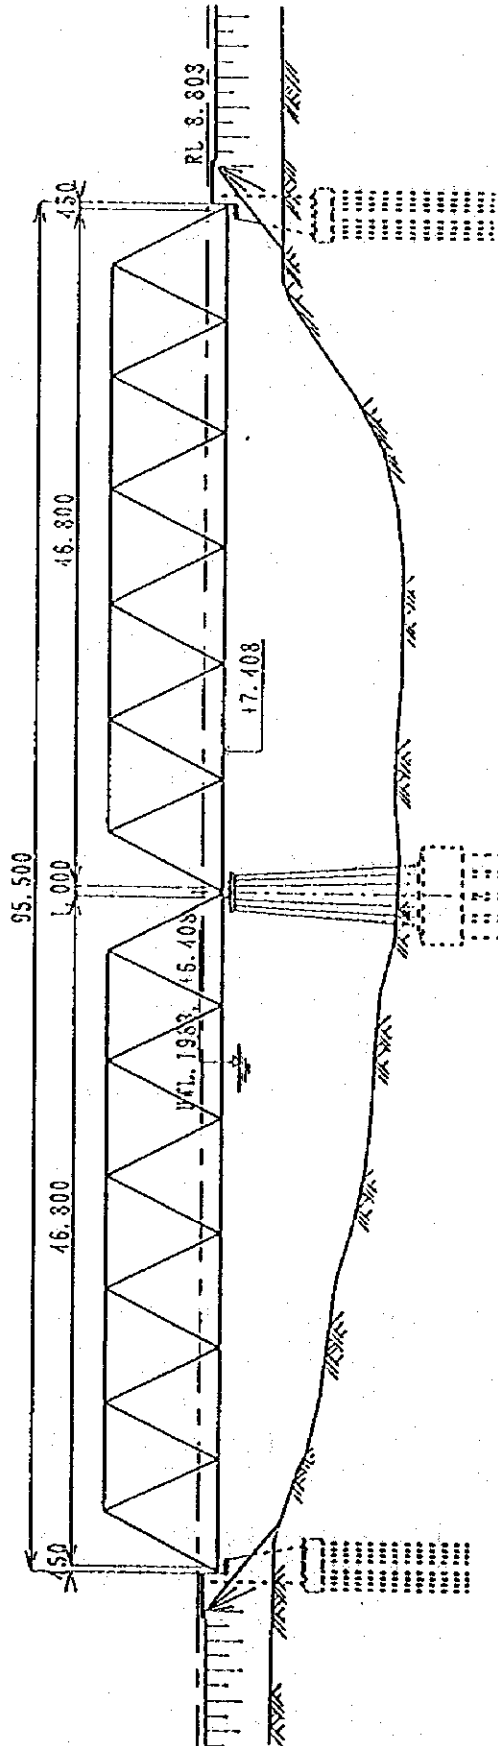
A Scheme for Bridge Improvement (Lai Phuoc Bridge)
